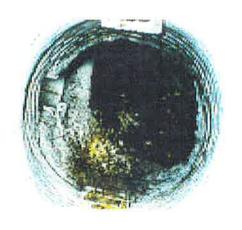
LOOSE AND MISSING MANHOLE BRICKS
